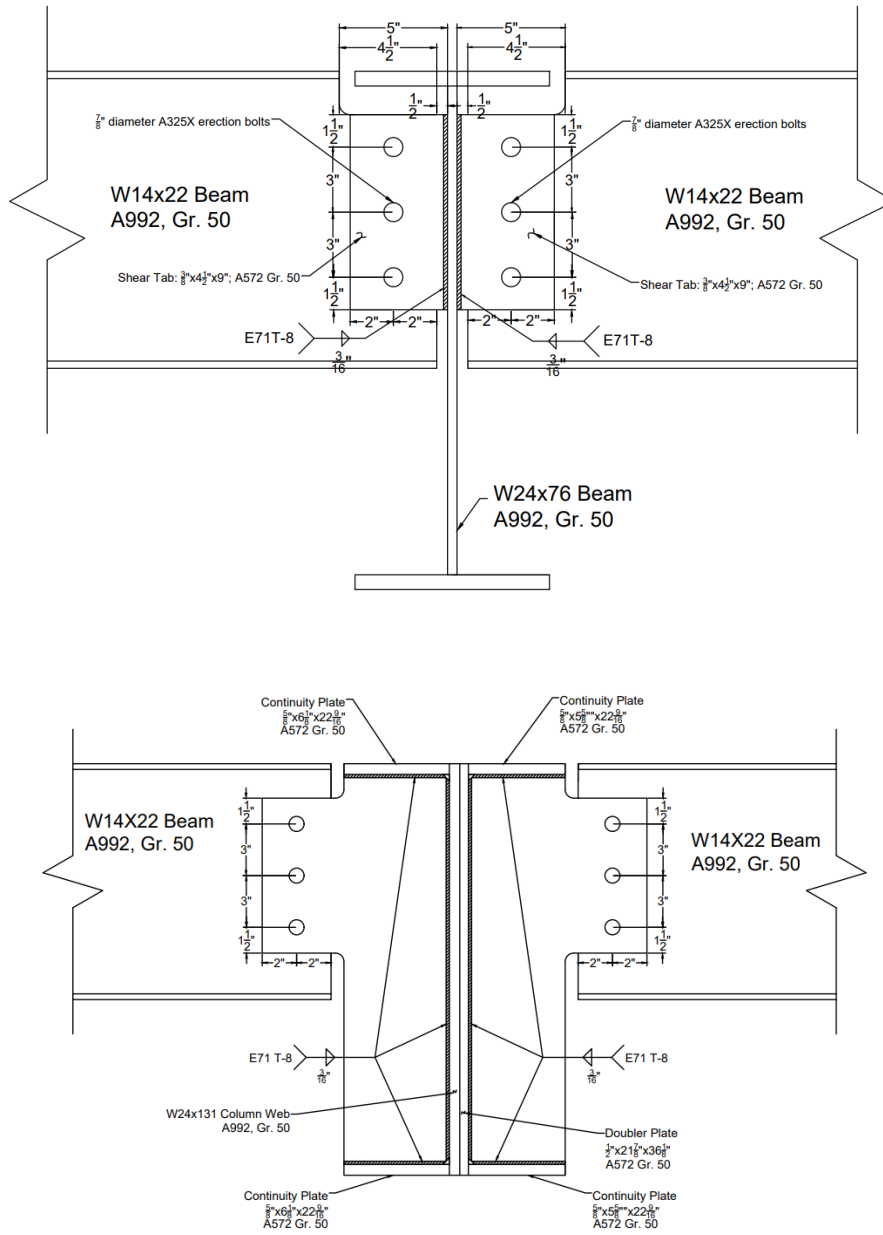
(a) Coped beam connections, (b) Extended shear tab connections.
